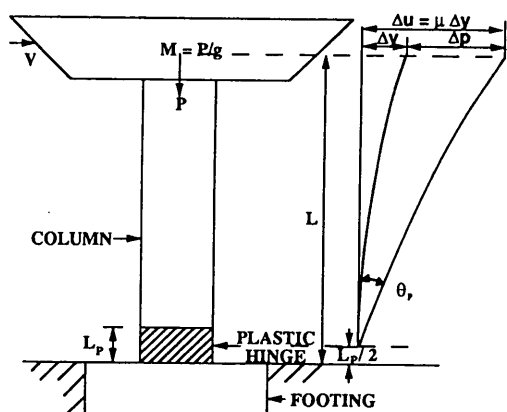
Lateral seismic response of a cantilever bridge column.
